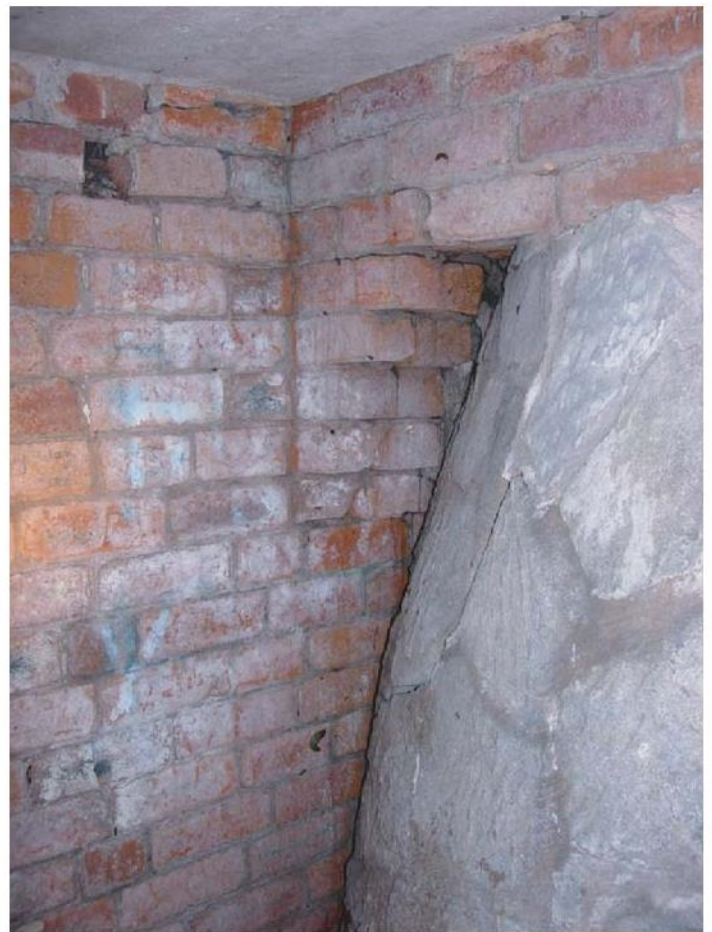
Detail Showing Brick Entrance Built Over Earlier Stone Walls
